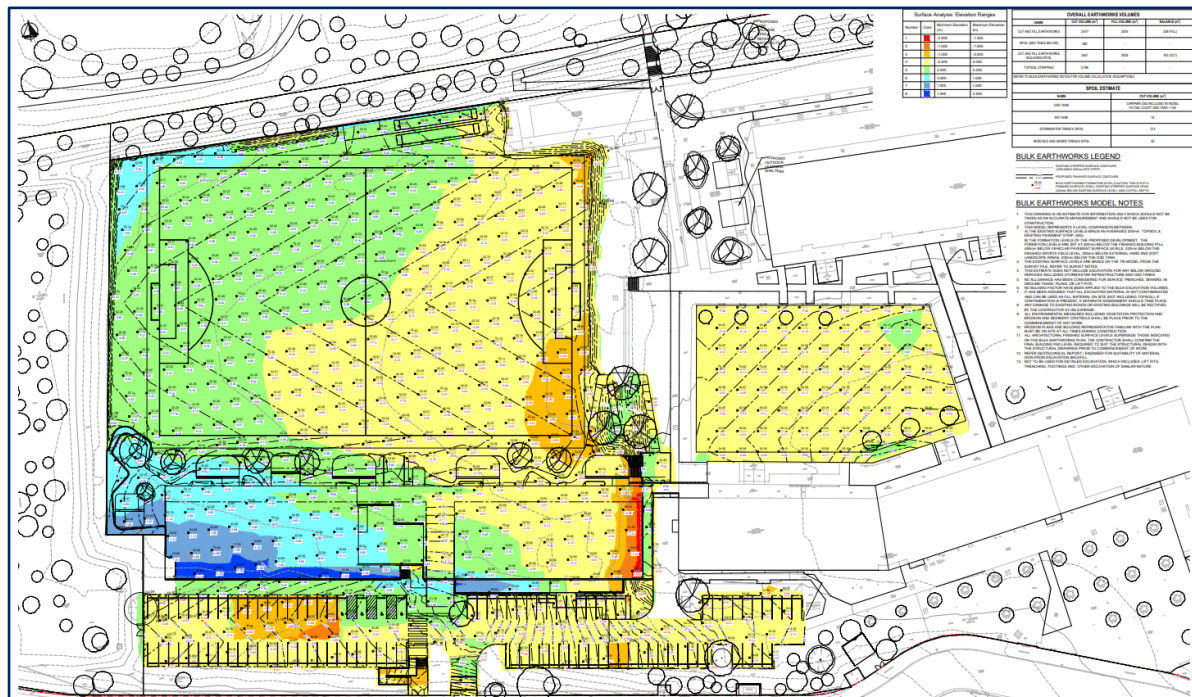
Proposed Indicative Bulk Earthworks Plan (Source: Enstruct)
